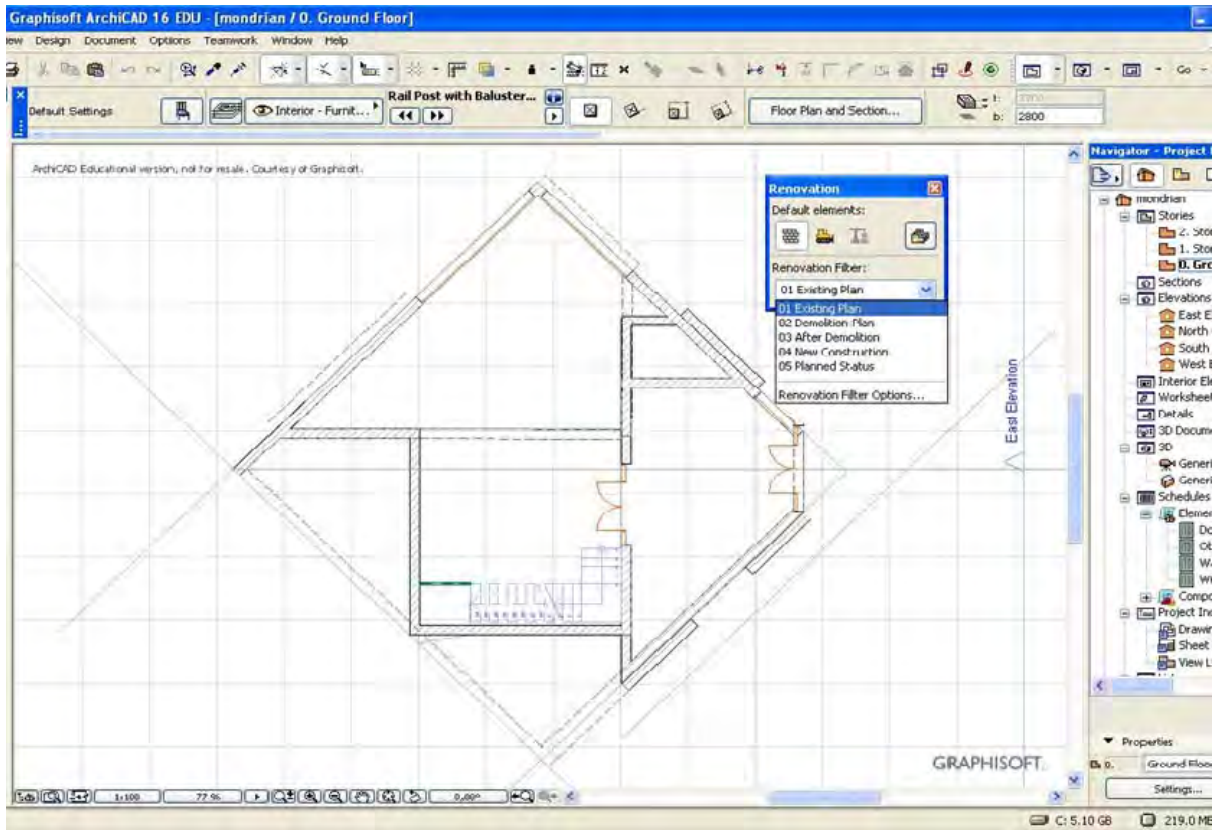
Today's BIM (Building Information Modeling) – House Mondrian, a house with green walls, designed by M. Bostenaru, 1993, digital modelling 2013. Economic computation in Bursa Constructiilor will follow. http://www.constructiibursa.ro/casa-mondrian-19129&s=proiecte&articol=19129&editie_precedenta=2013-06-28.html
